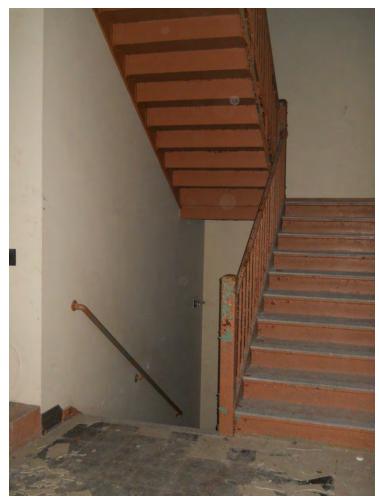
Typical Stairwell with deteriorated painted surfaces and floor tile
